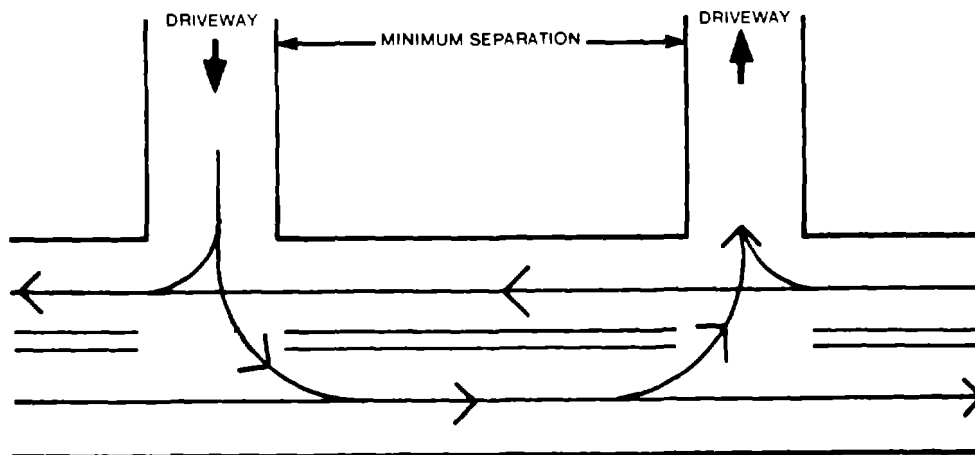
MINIMUM DRIVEWAY SPACING
